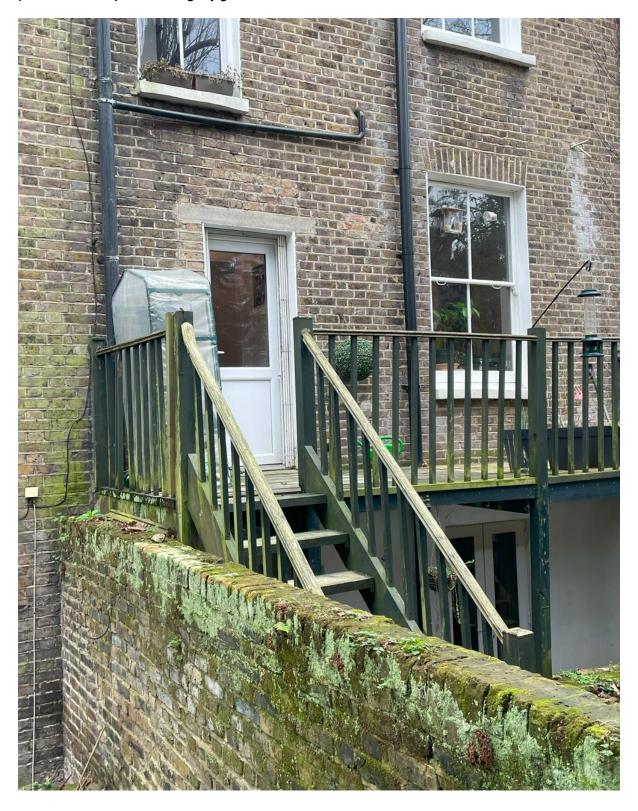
136 Belsize Road (neighbour): Door at the <u>ground floor</u> leading to a wooden platform (1.7m extension) overlooking my garden
